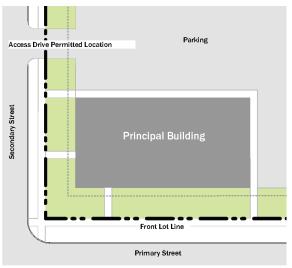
G (2). Secondary Street Frontage: Access Drive Permitted Location
